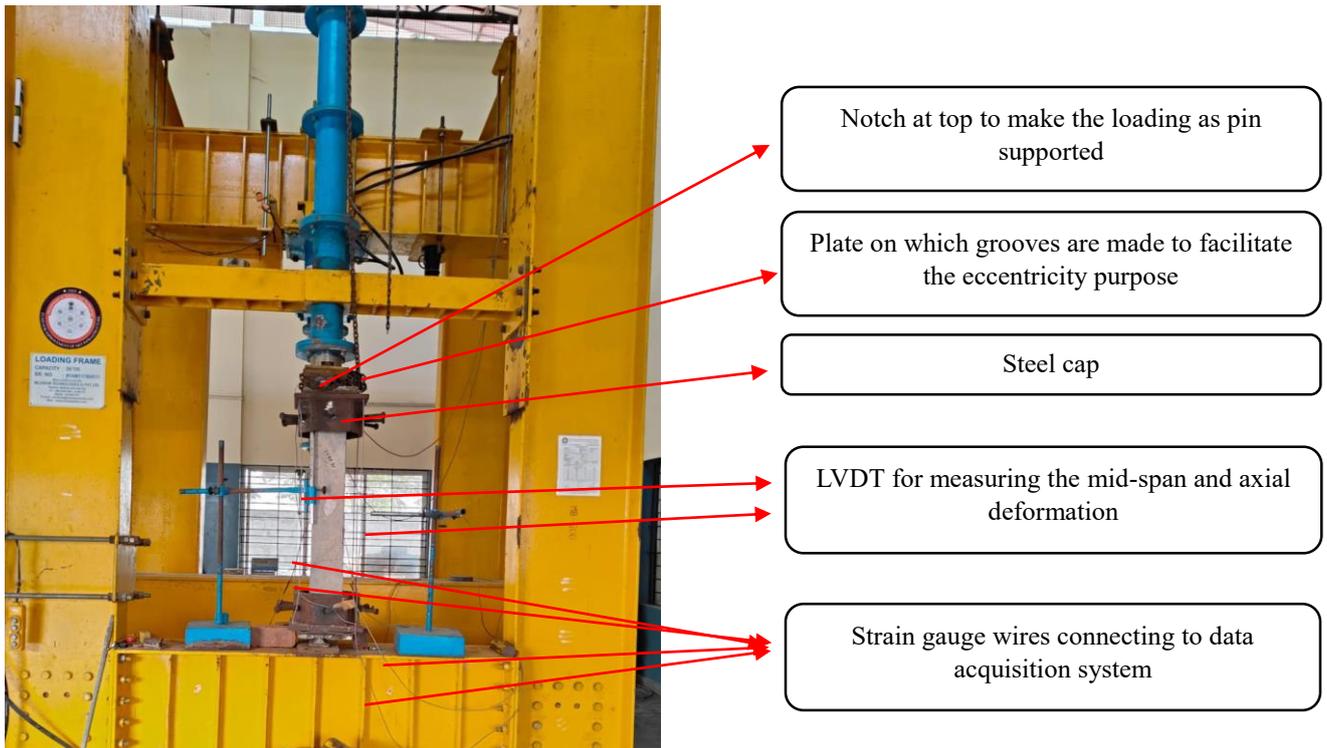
Testing setup of the specimen subjected to eccentric loading
